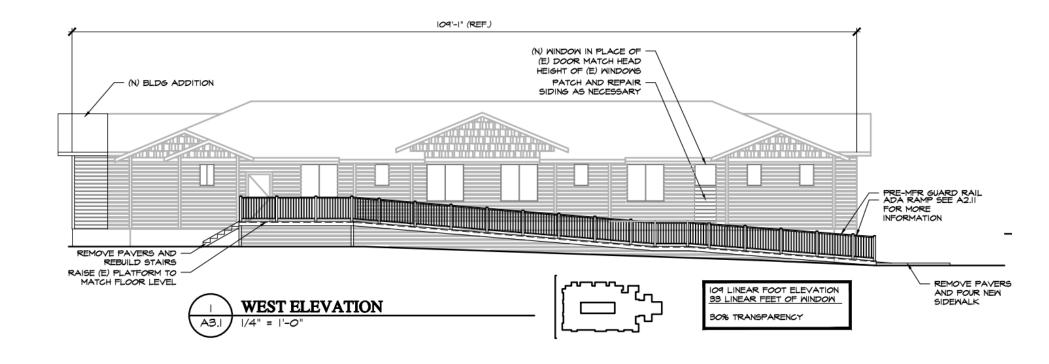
Proposed Modifications to West Elevation – Rear of Building facing Parking Lot – (Not to Scale)
